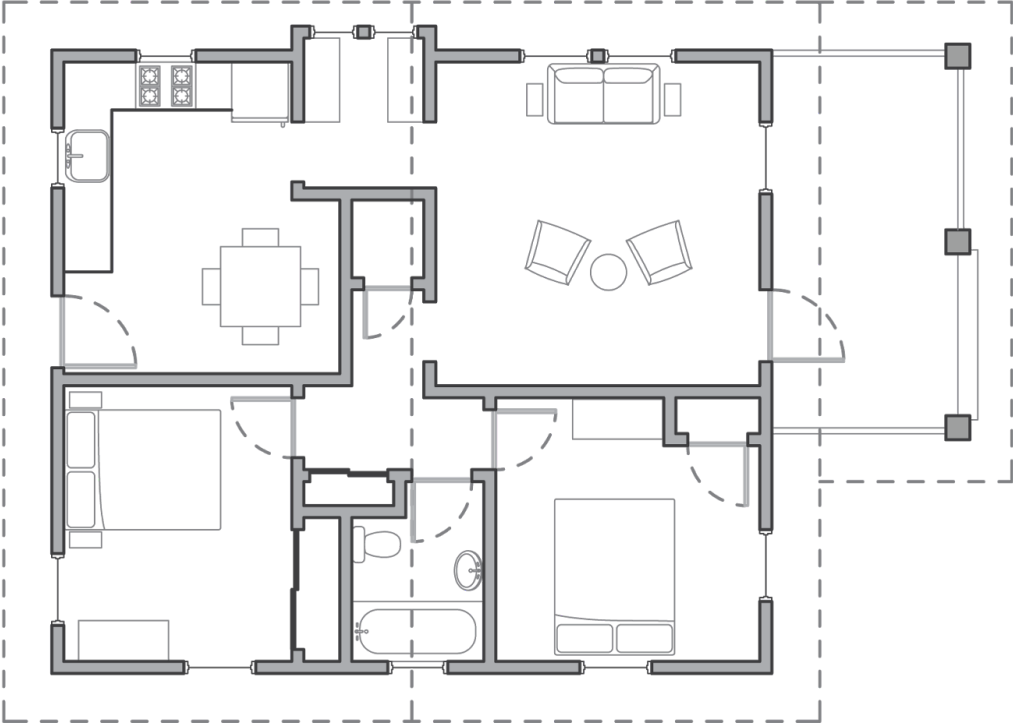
Bungalow Floor Plan - Ground Floor (Author 2015)
